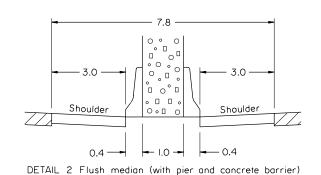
RURAL-URBAN MULTI-LANE DIVIDED HIGHWAY TYPICAL CROSS-SECTIONS
